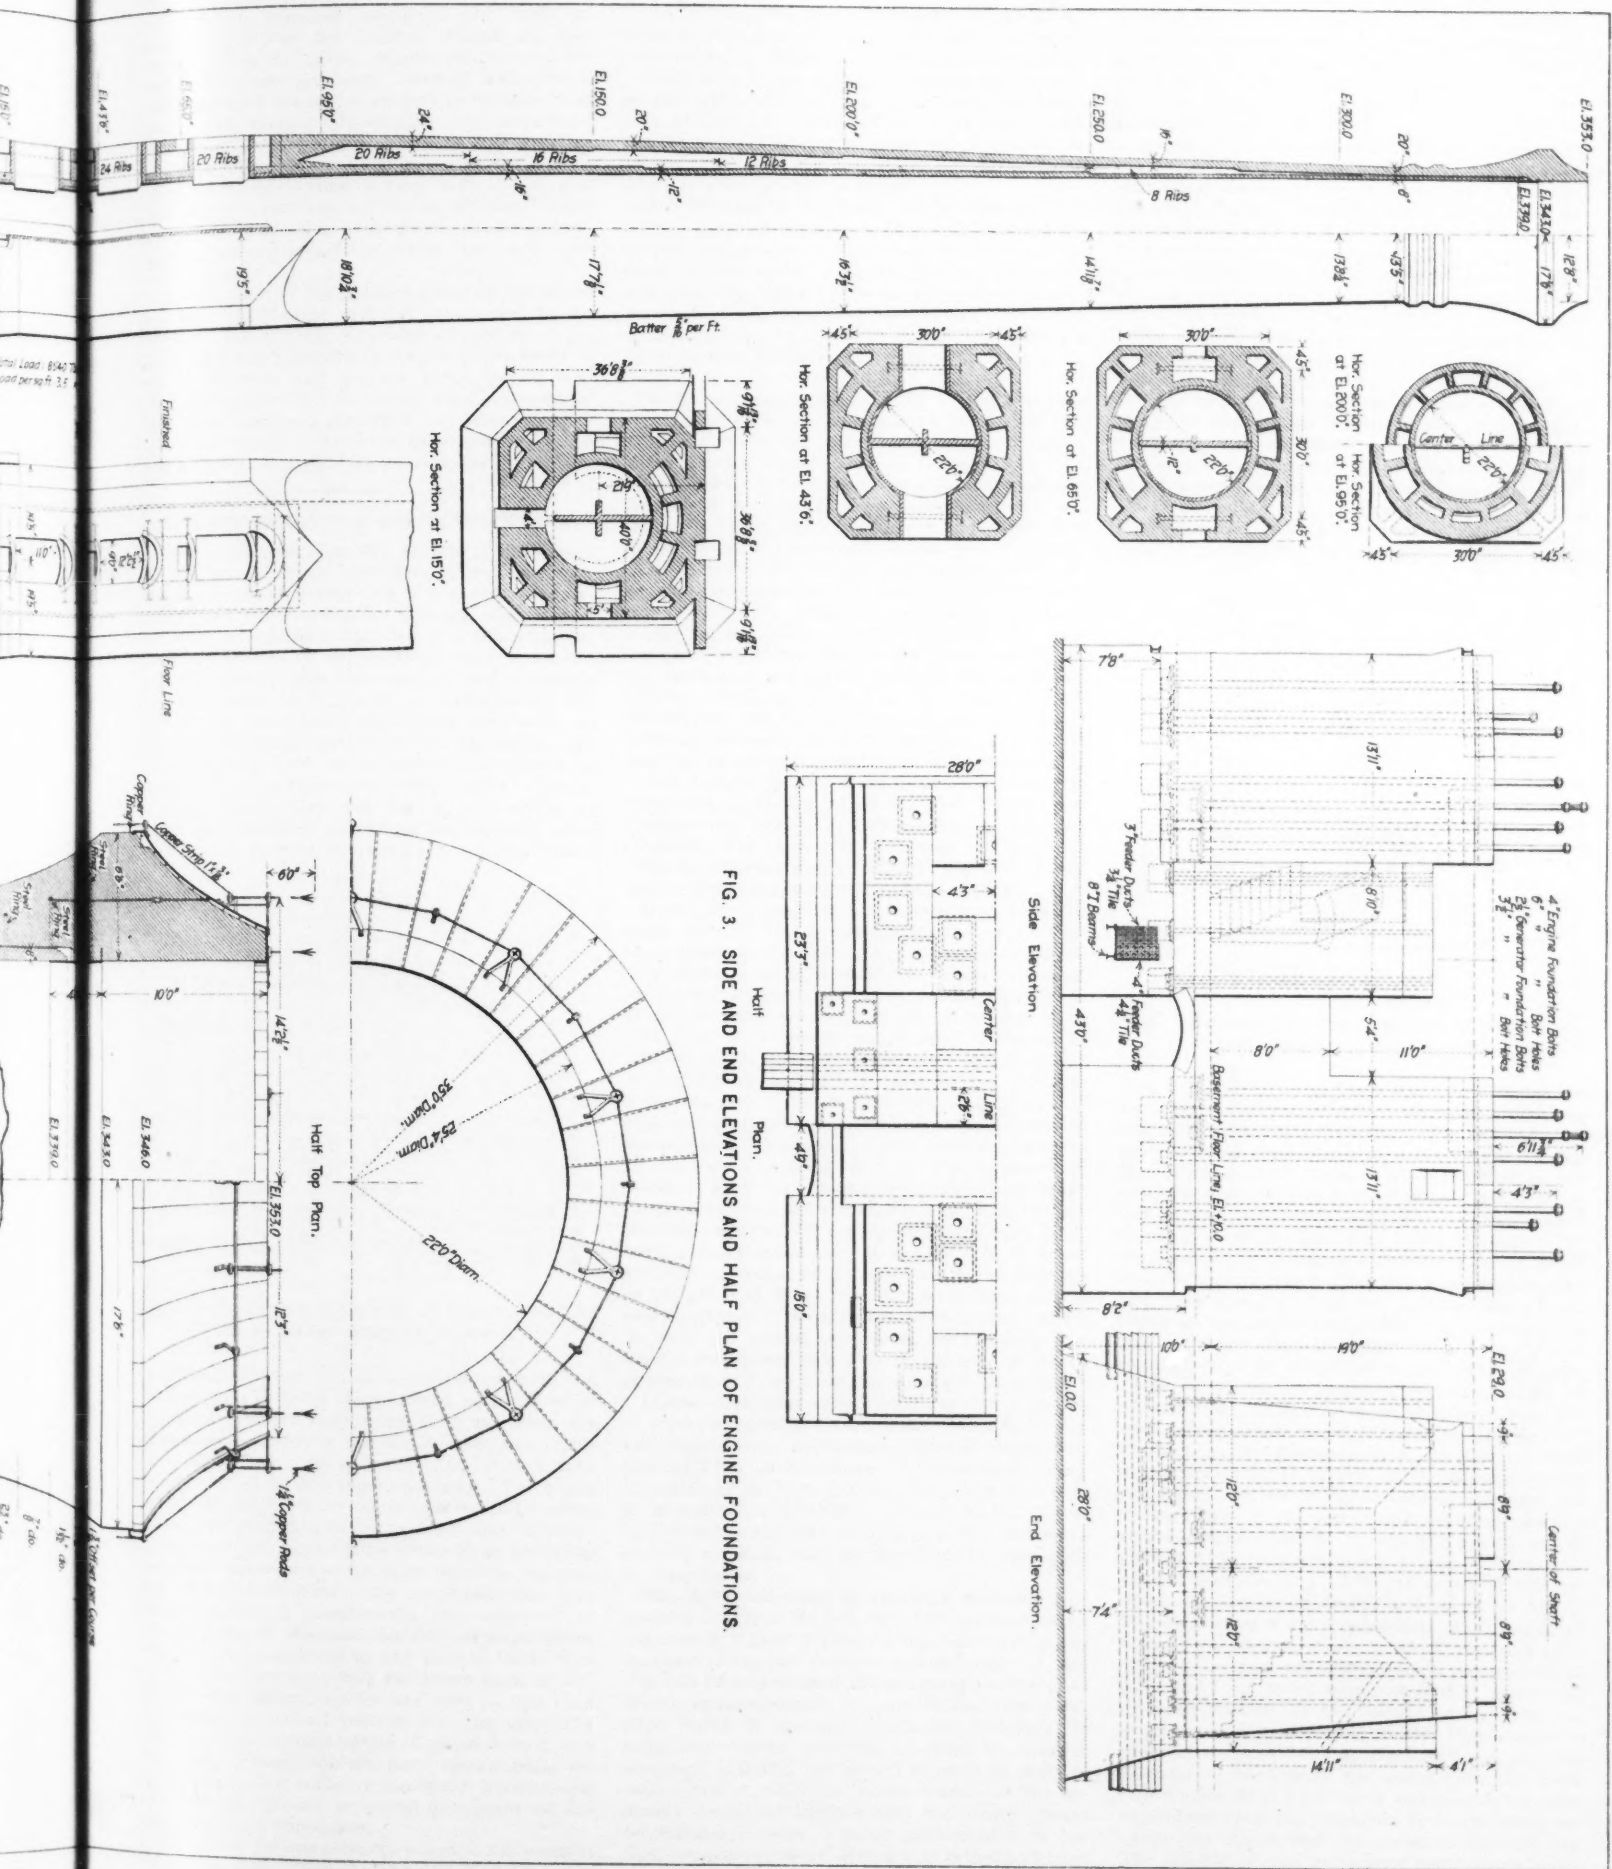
SIDE AND END ELEVATIONS AND HALF PLAN OF ENGINE FOUNDATIONS.
